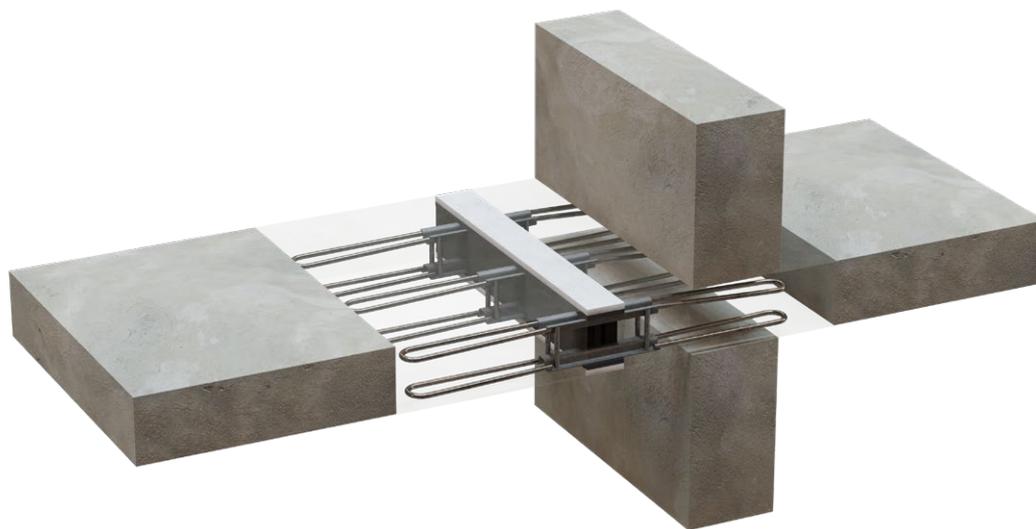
TIPOMEGA® connector anchored in the floor slab using U1-shaped bars welded to the upper profile
